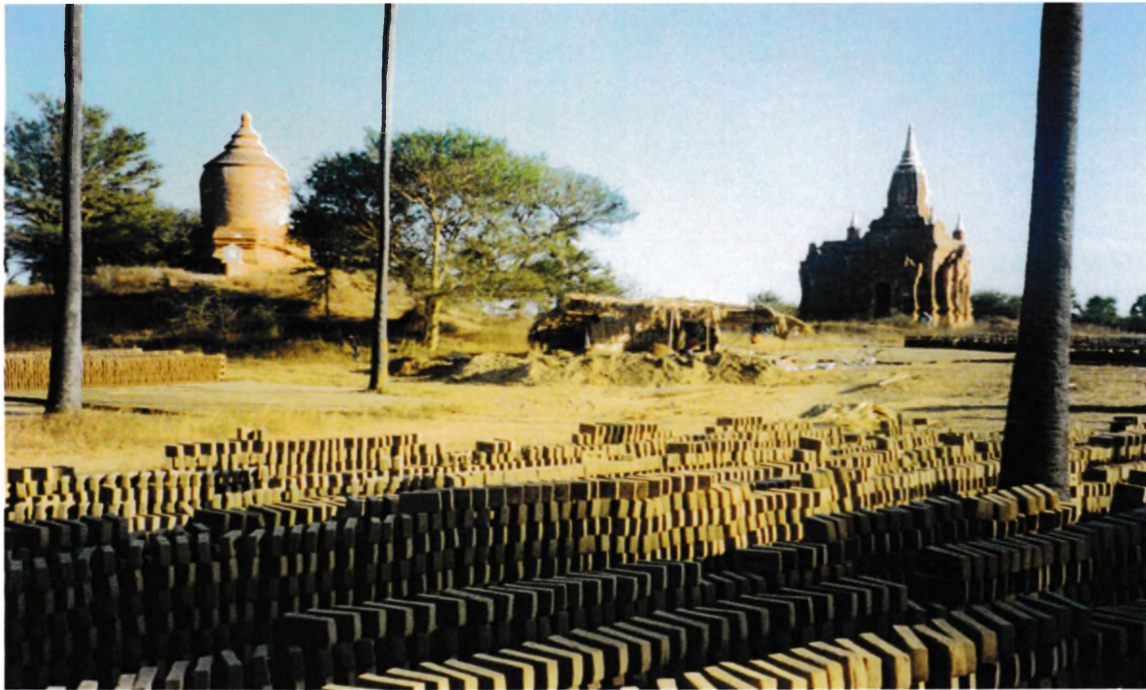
Bricks drying at a brick factory at Bagan, Burma, with brick-built stupas in the background.
